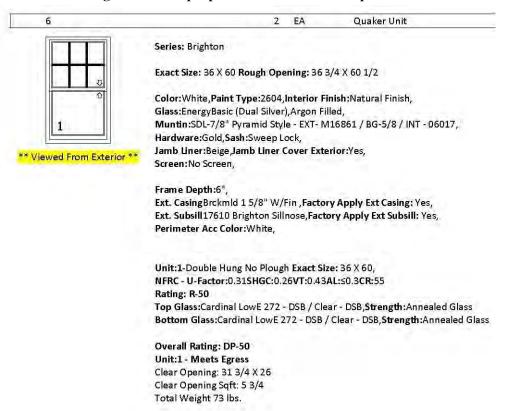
New window proposal for north and south elevations of 3135 Lexington Rd., Line 6
